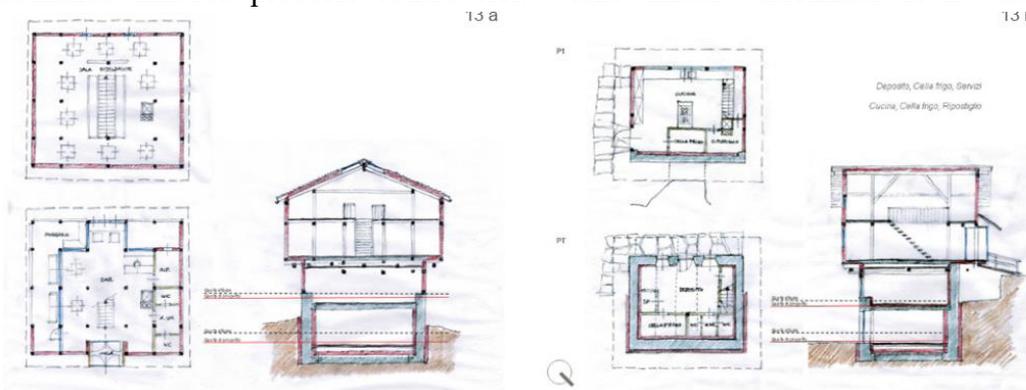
a-b project proposal - plant and sections/ proposition de projet: plantation et section
